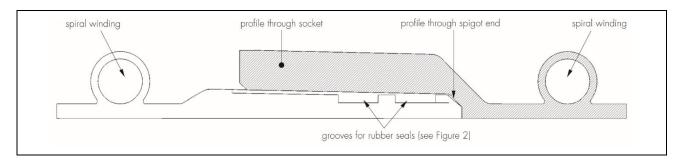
Ridgistorm 750 mm and 900 mm pipe — cross section through pipe joint
